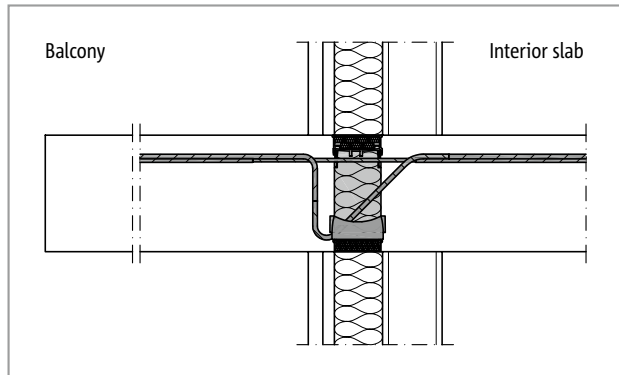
Schöck Isokorb® T Type CK: Balcony with steel stud wall, cavity insulation and facade cladding
